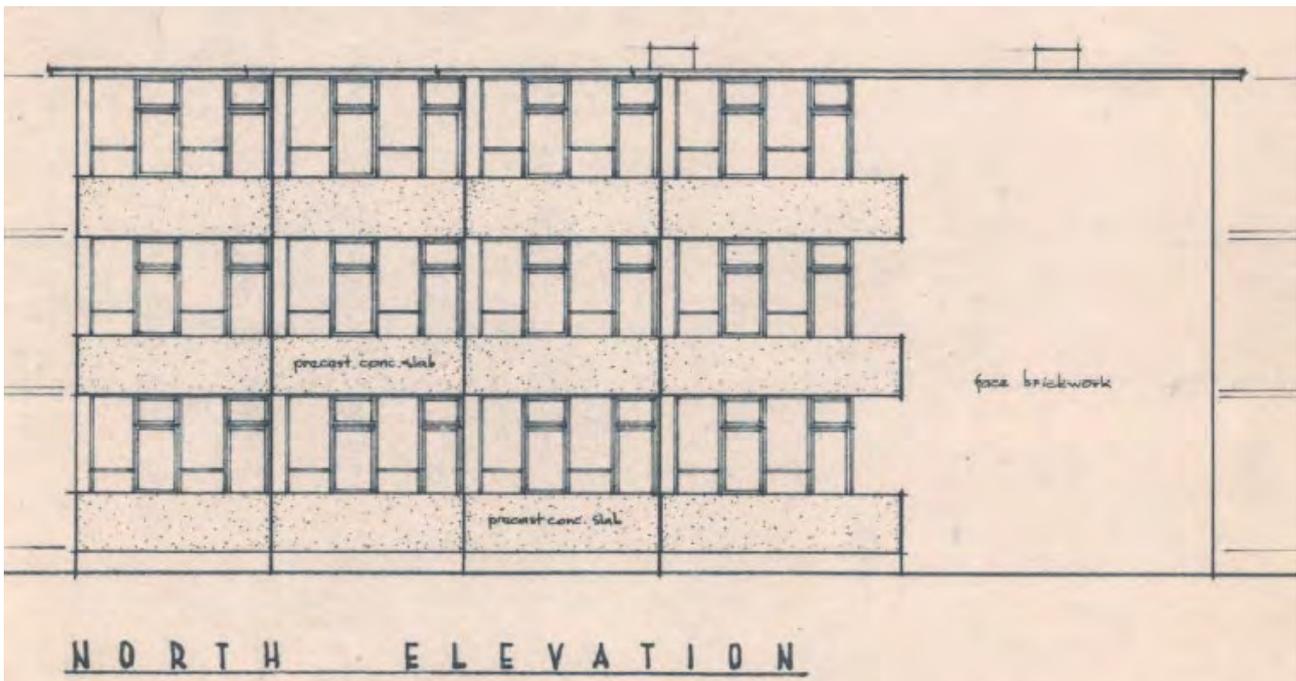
Front or north elevation, Dandenong Road (Source: Council Building File)
